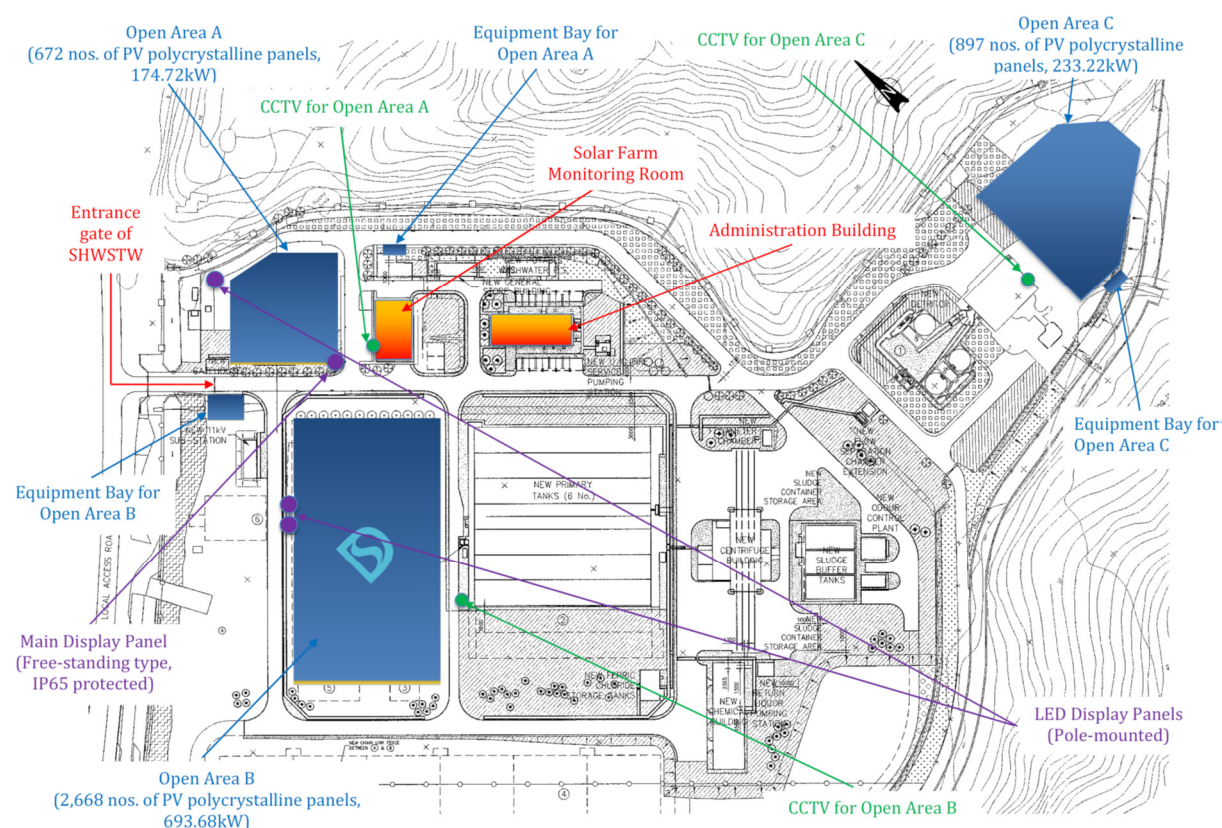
Layout Plan of Siu Ho Wan Sewage Treatment Works
